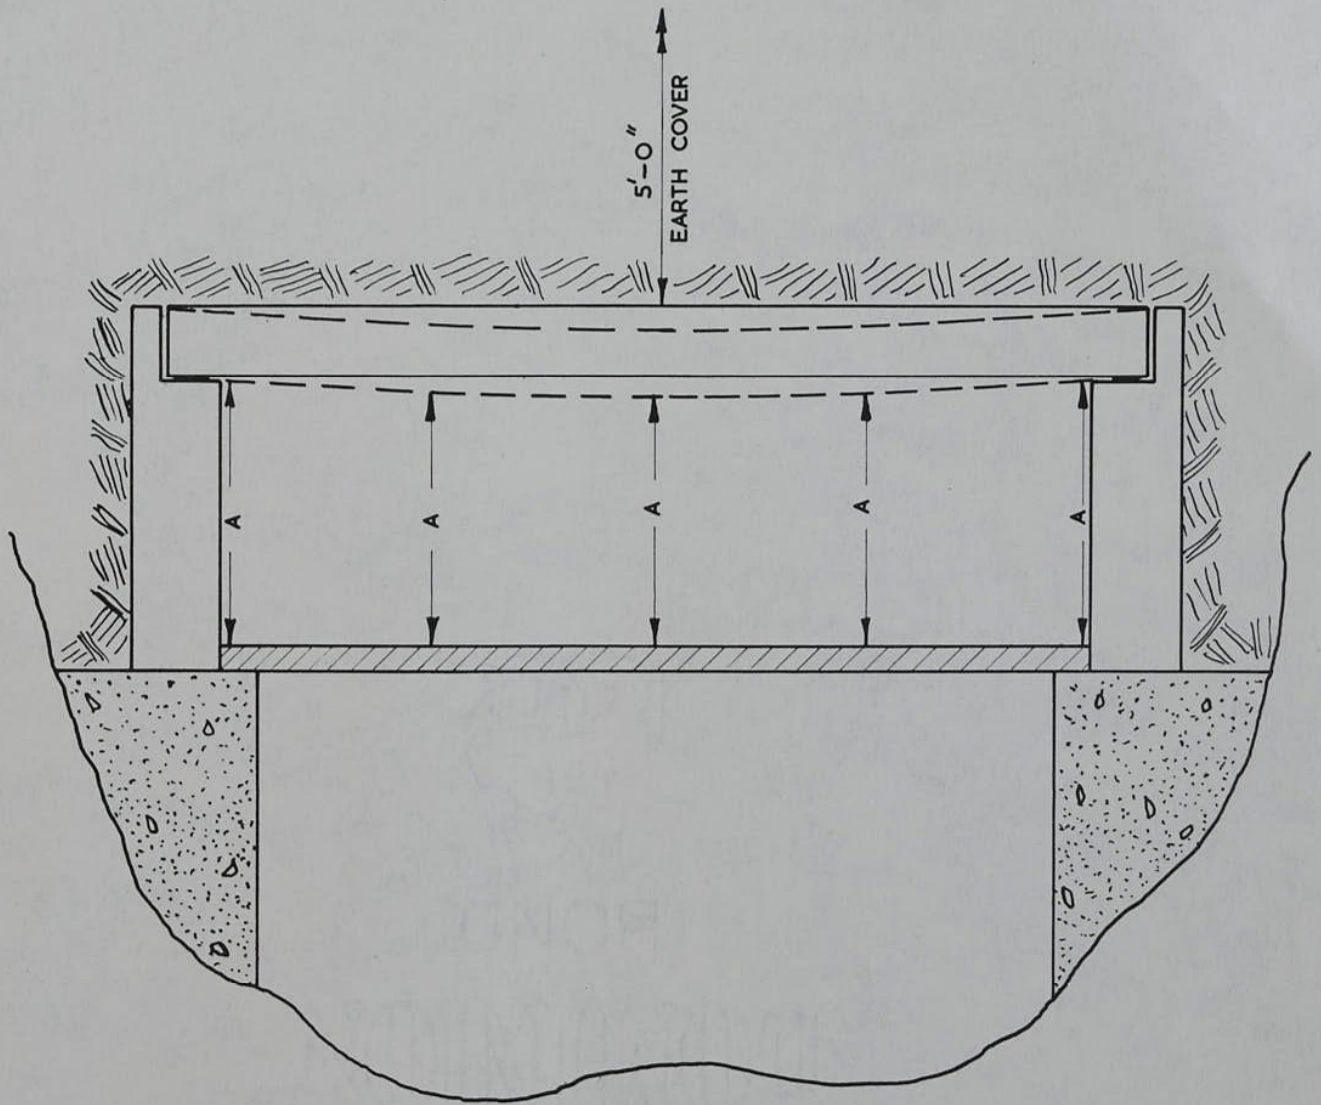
SKETCH SHOWING METHOD OF MEASURING
